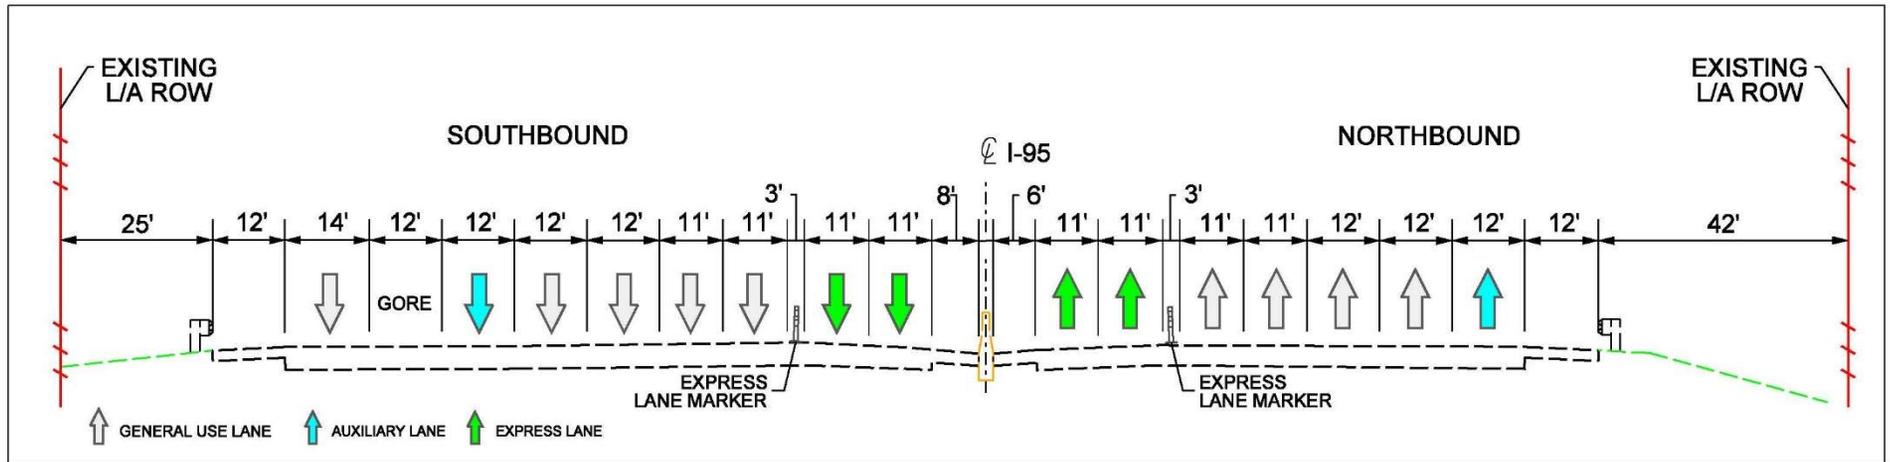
Existing Roadway North of Hallandale Beach Boulevard
